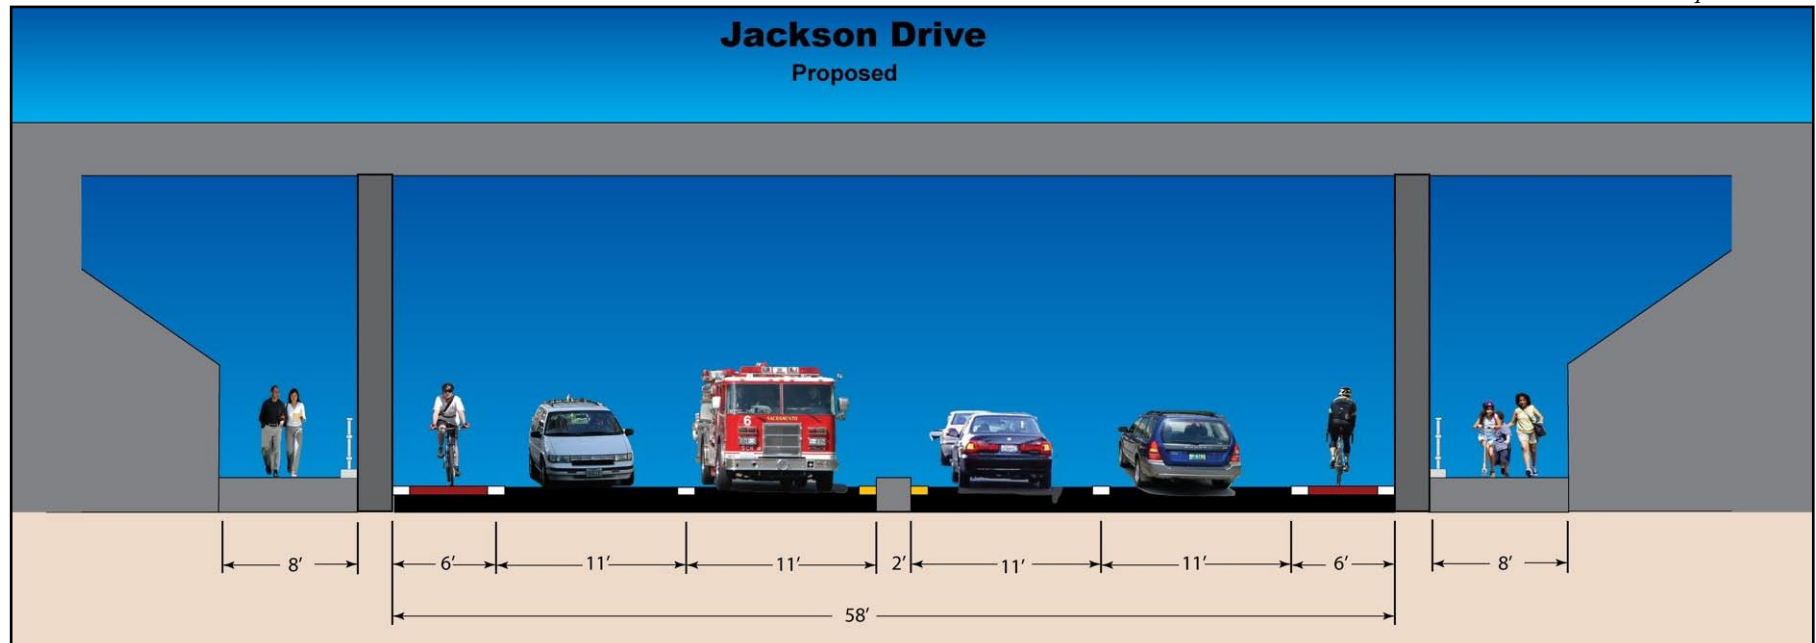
Recommended design for Jackson Drive with wider, colored bike lanes and new sidewalks buffered by existing pillars.
